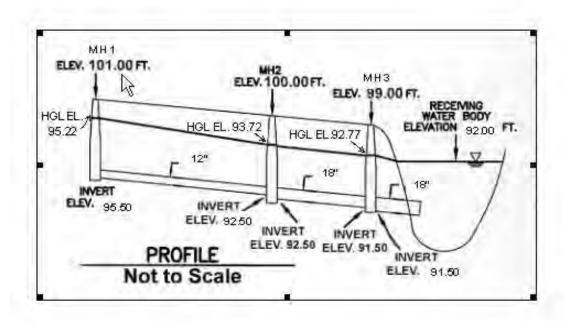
Sewer Profile with Calculated HGL Elevations
